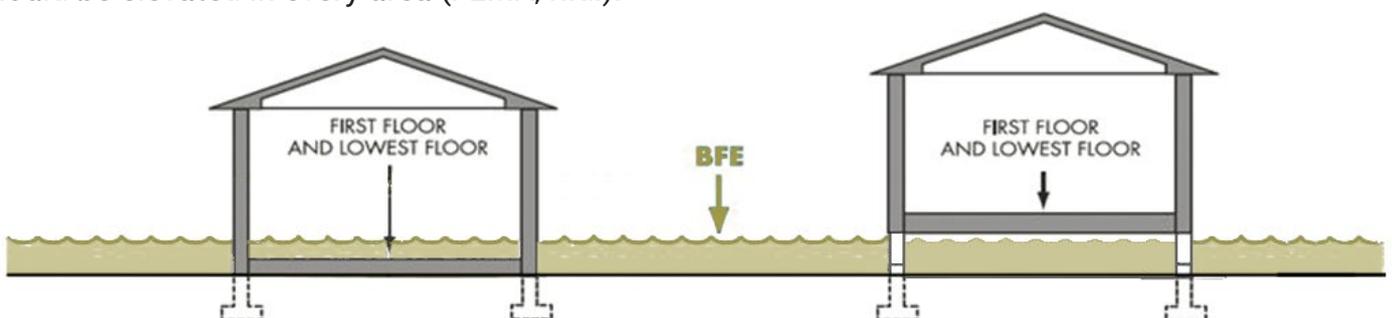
Elevation of foundation. Source: Nadeau, J..
